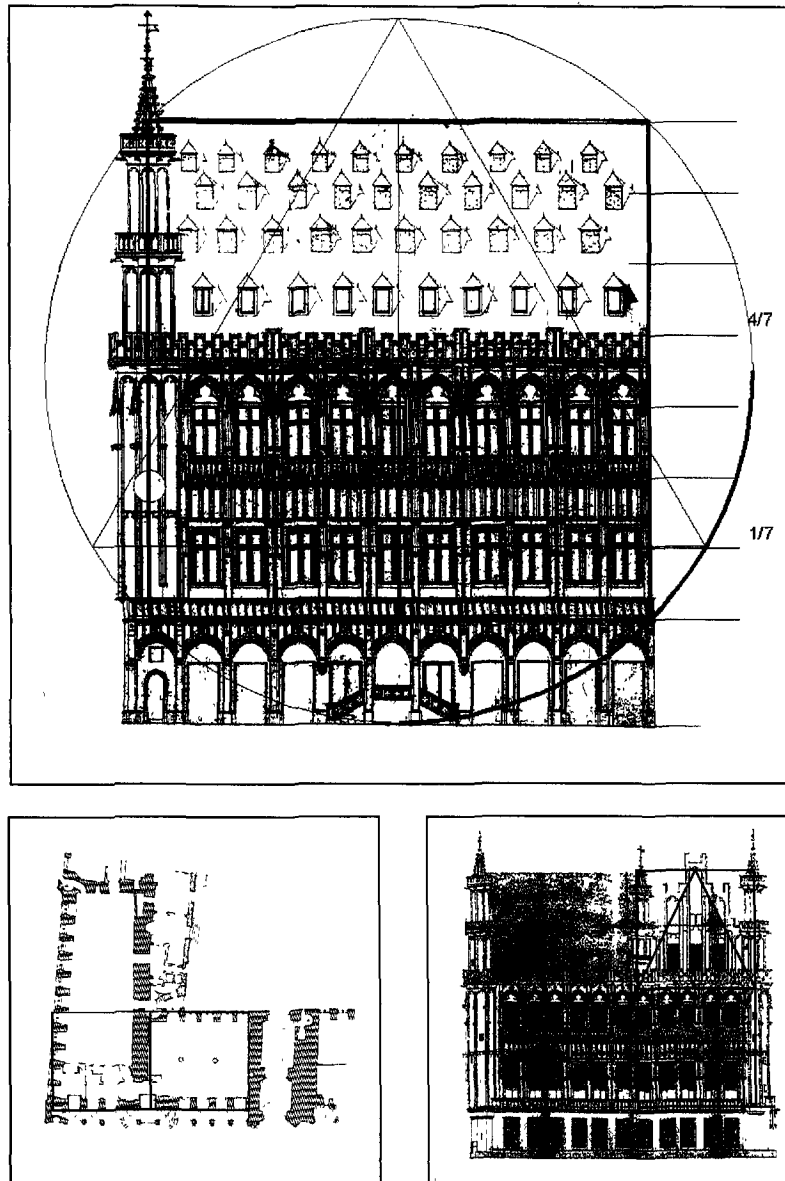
facade composition for Brussel; relations between plan & elevation. Note that for Brussel only the oldest front wing of the building is considered. The more recent half of the building, right of the central gate and tower (not on plan), does not seem to obey to the design system of the first building concept.
